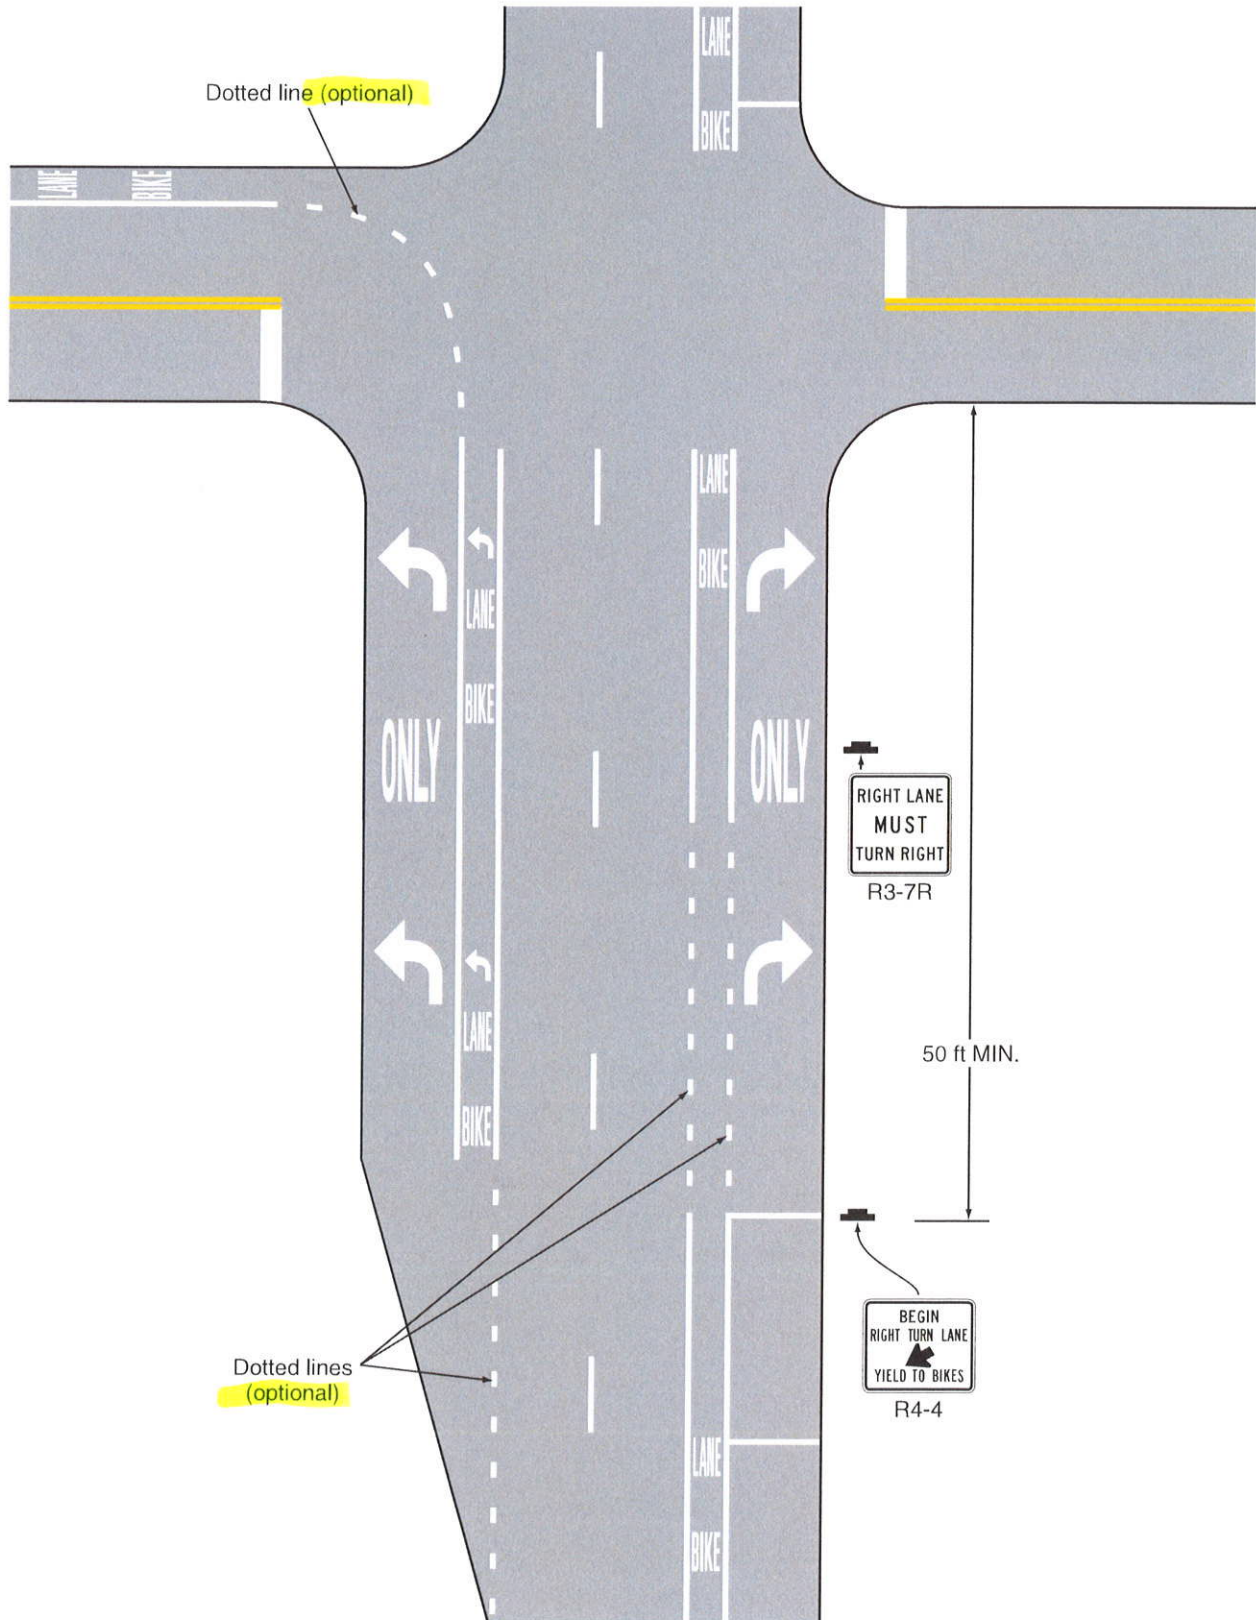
C-6. Example of Pavement Markings for Bicycle Lanes on a Two-Way Street
